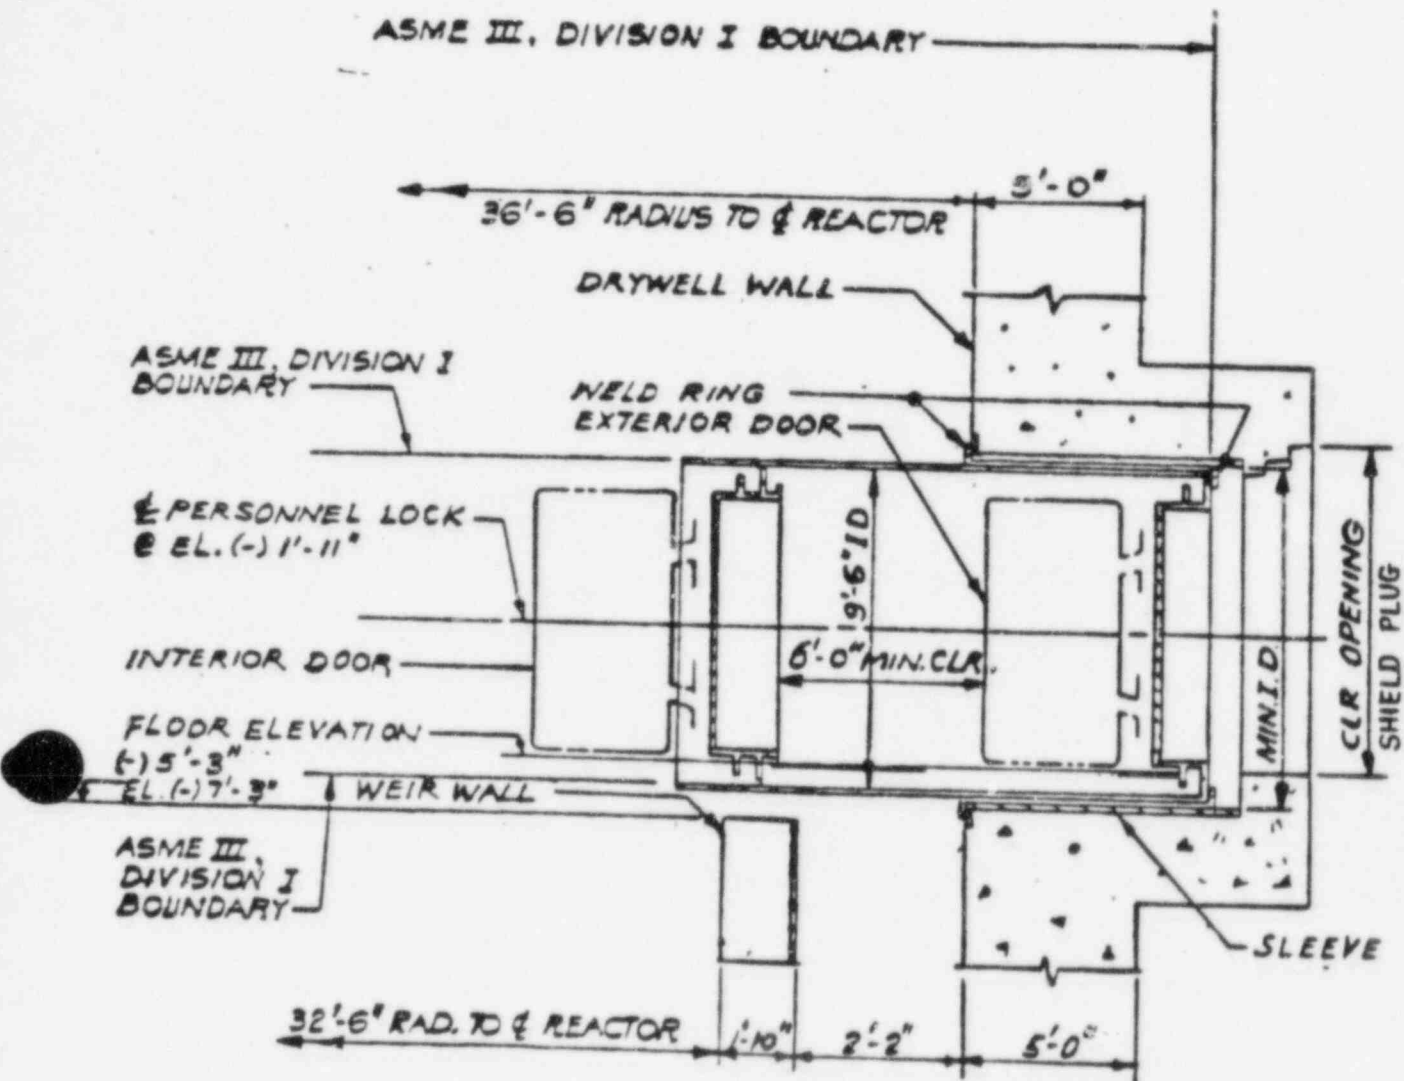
ELEVATION VIEW OF DRYWELL STRUCTURE PERSONNEL AIRLOCK
